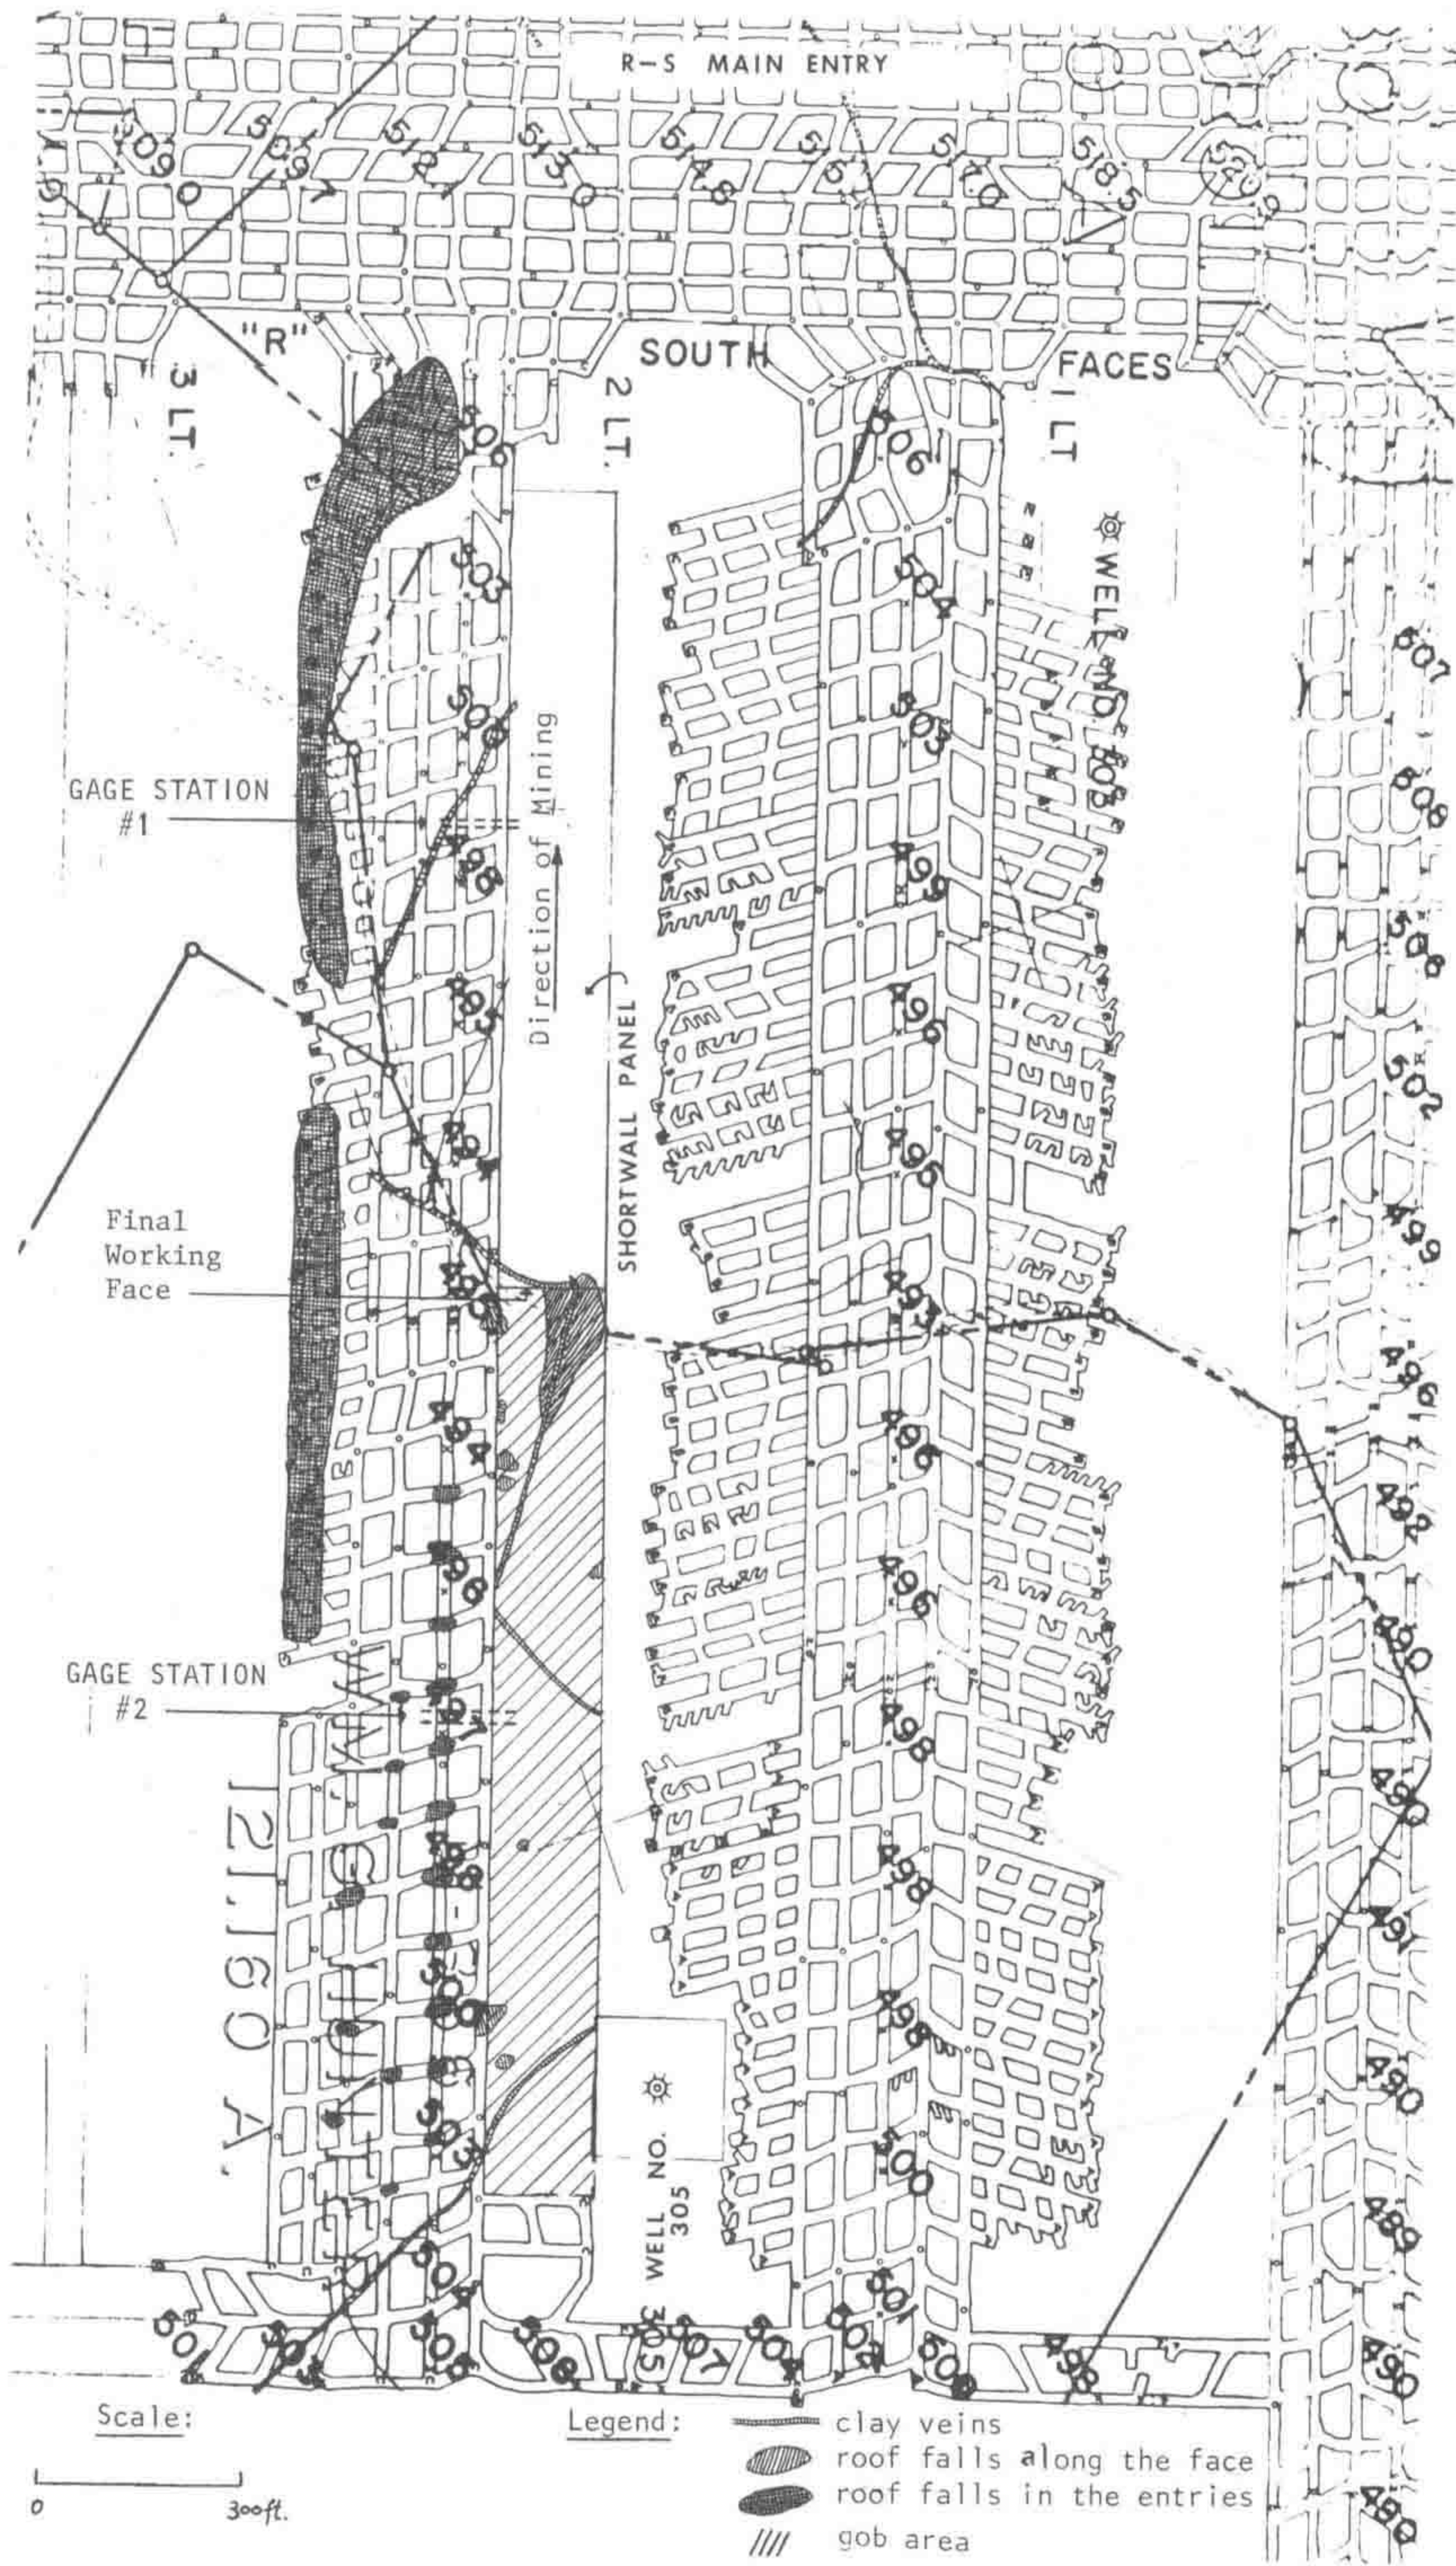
SHORTWALL PANEL LAYOUT WITH CLAY VEINS AND ROOF FALLS.
